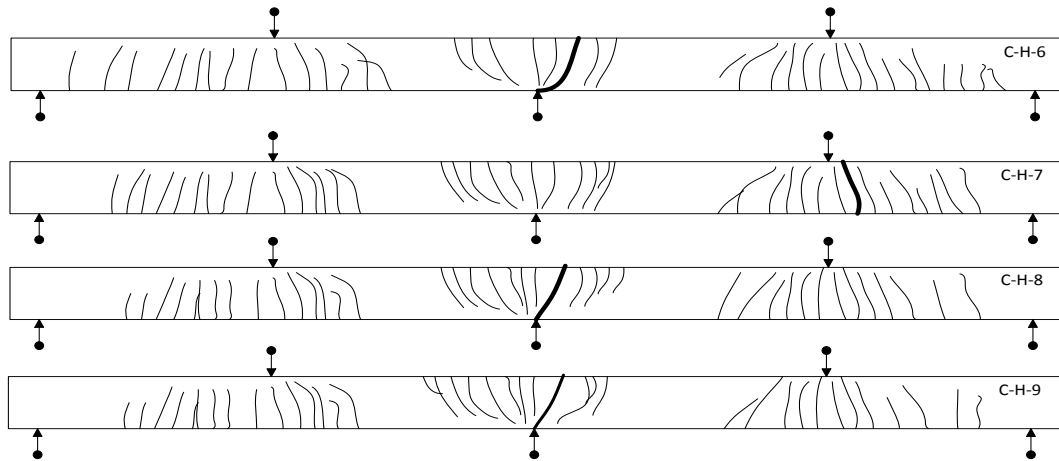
Crack patterns at failure of continuous concrete beams tested
